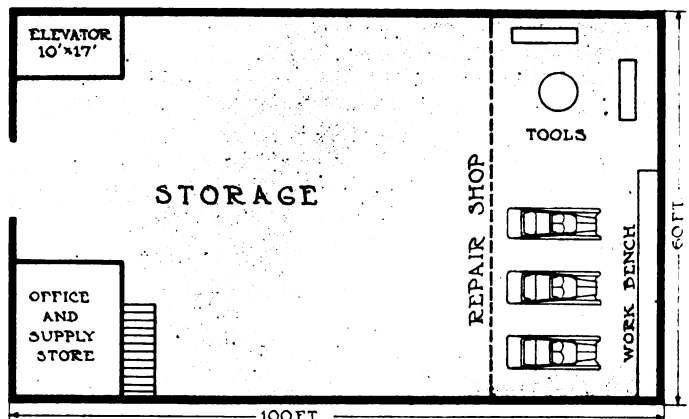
Plan of ground floor of public garage 60 by 100 feet
